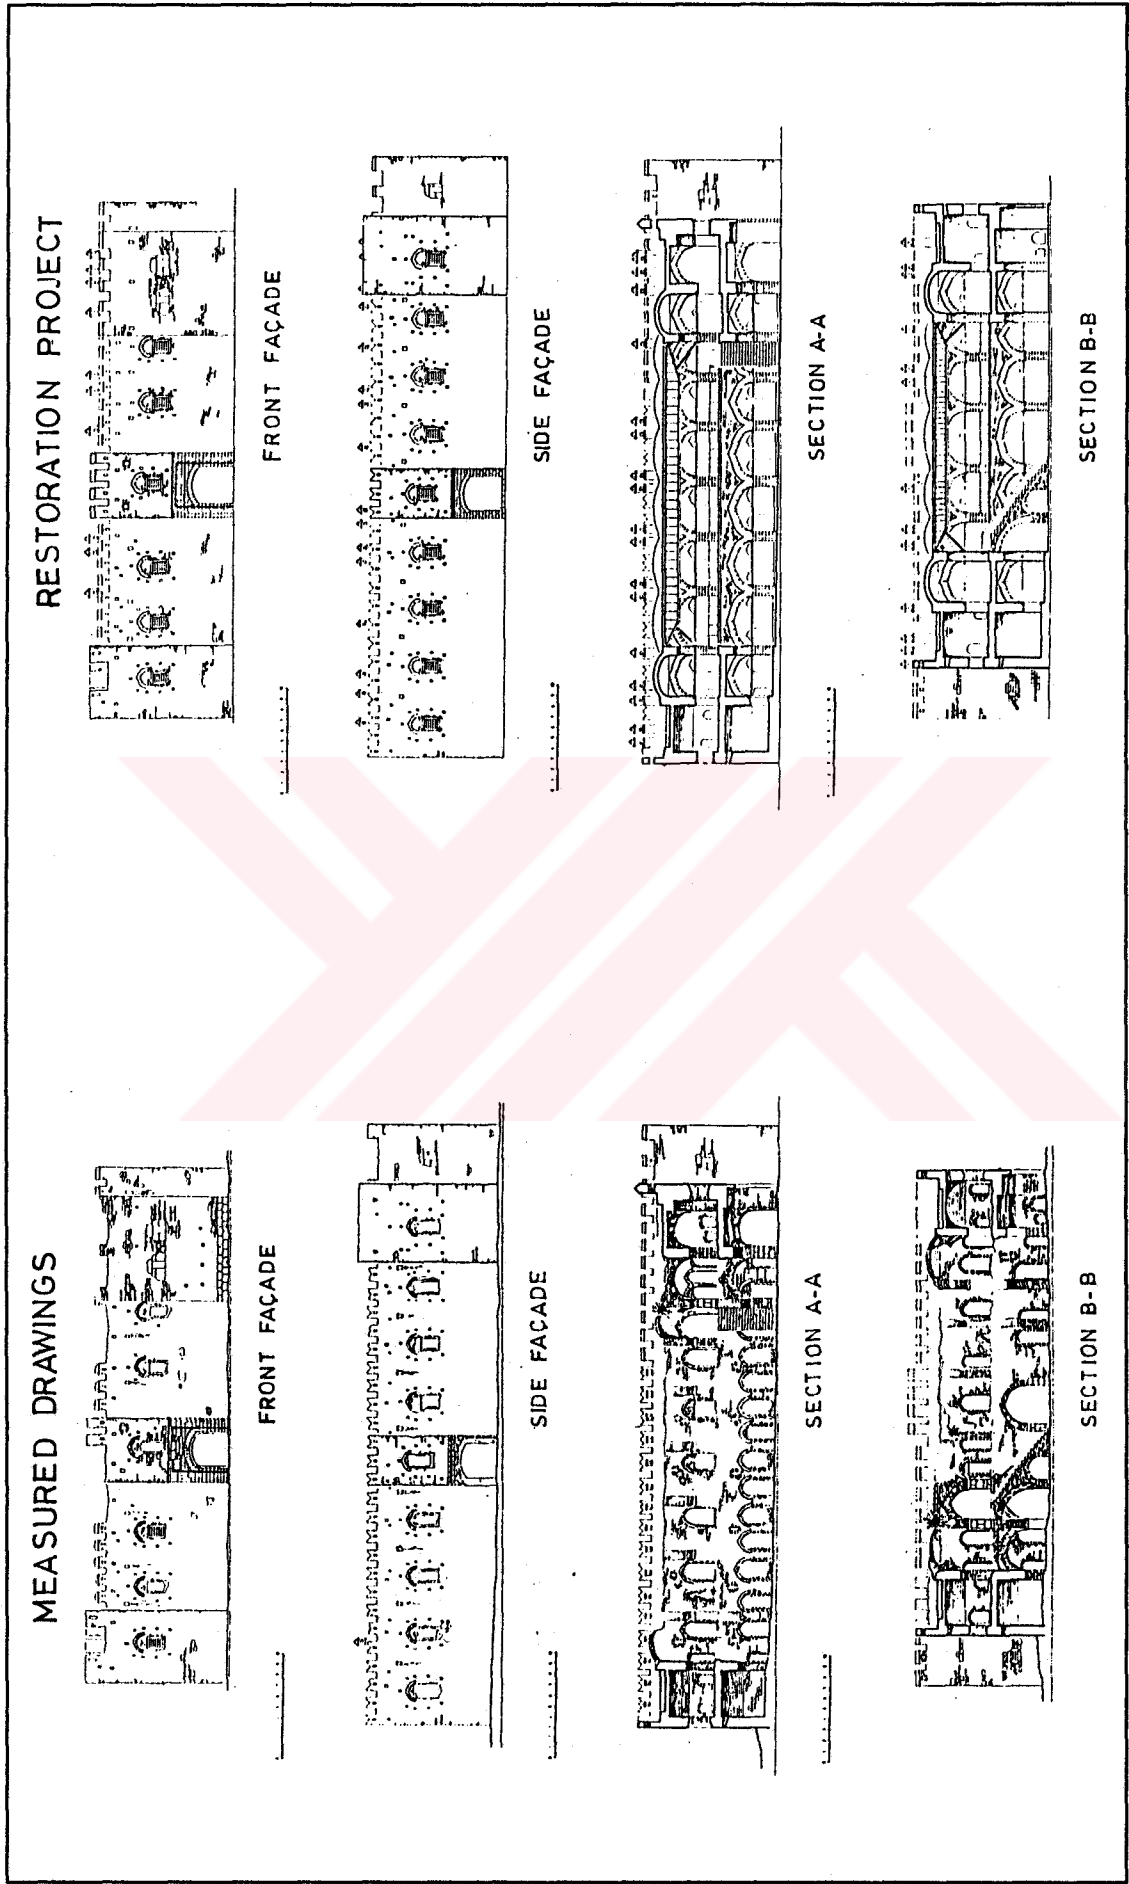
Öküz Mehmet Paşa Caravanseraı in Kuşadası - Façade and Section Drawings
